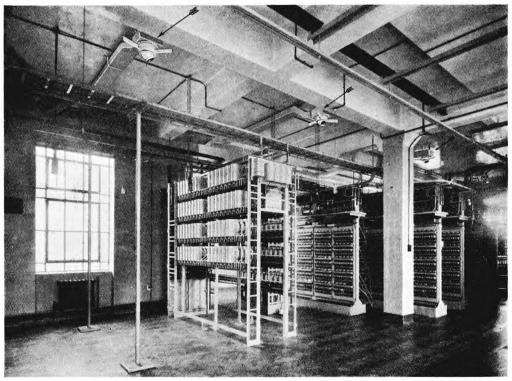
Ventilating Ducts and Louvres in an Automatic Apparatus Room.
